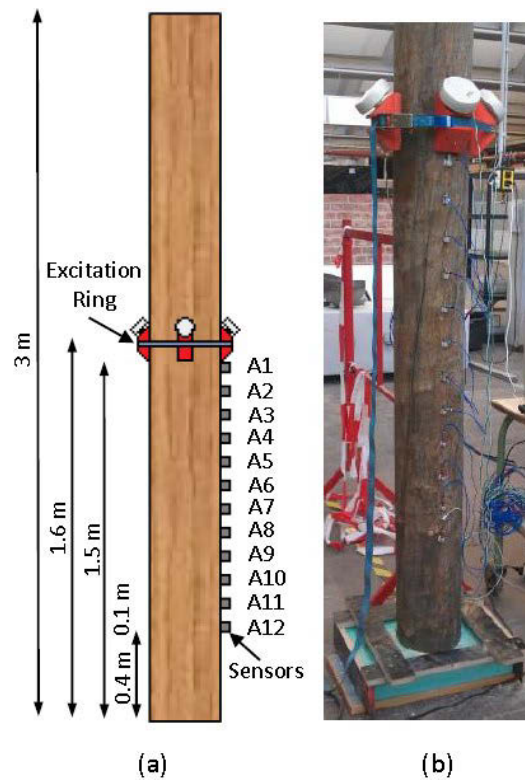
Testing set up and dimensions - (a) and (b) line measurement set-up (Dackermann et al., 2015)
